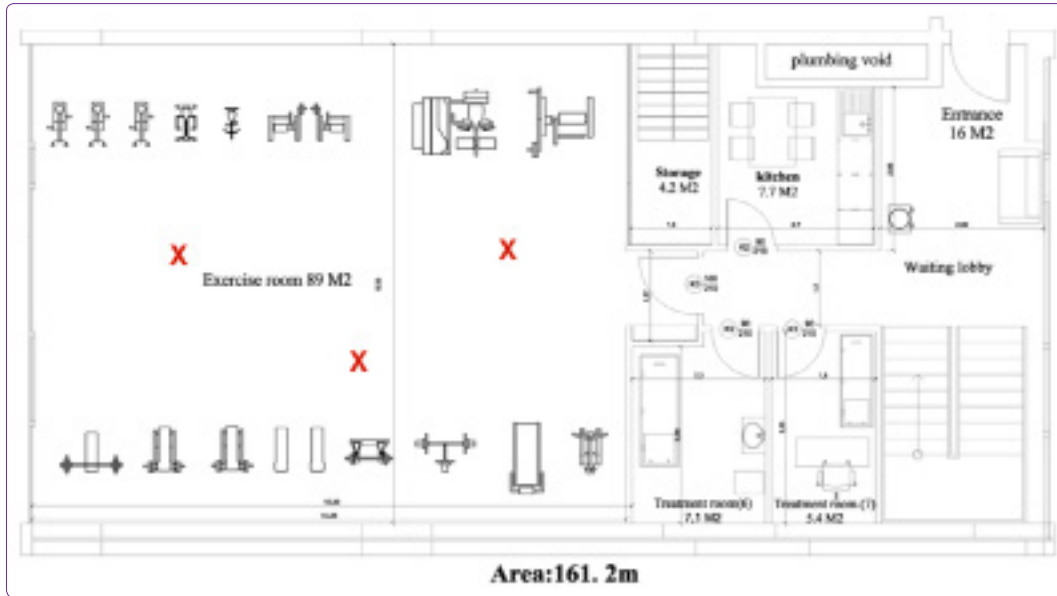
Second floor plane of the case space showing treatment and exercise rooms.
